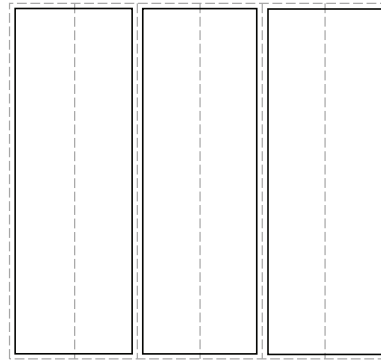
Placement of plasterboards on the wood beams in the ceiling. The dashed lines mark the wood beams.
